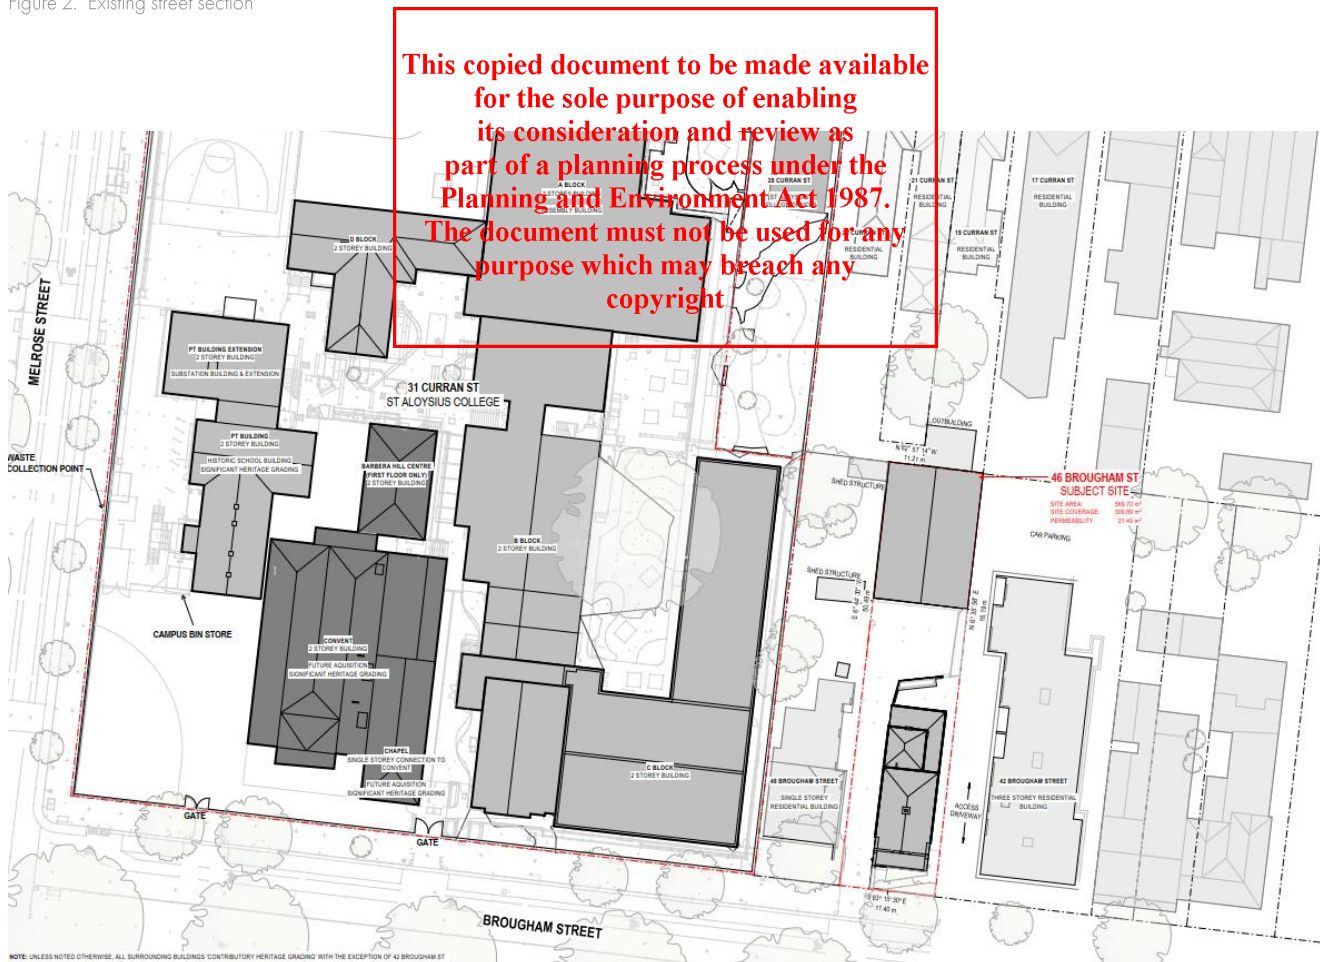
Site context for 46 Brougham Street and adjoining land uses.
